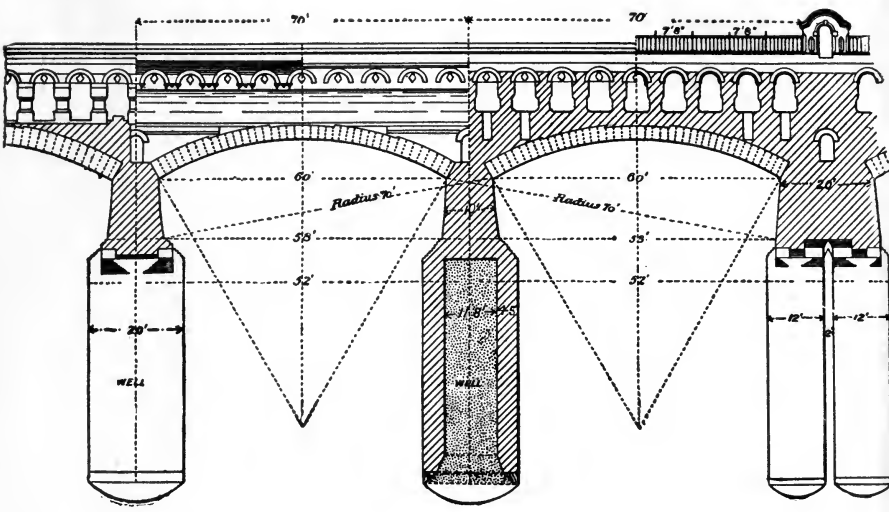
PLATE XV.—ELEVATION AND CROSS-SECTION OF NADRAI AQUEDUCT, LOWER GANGES CANAL, INDIA.
